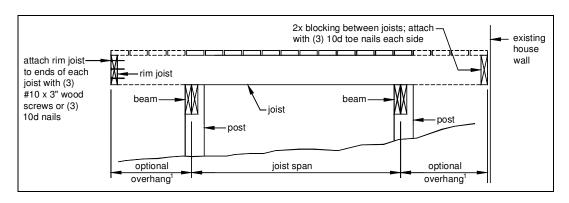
JOIST SPAN – FREE STANDING DECK
